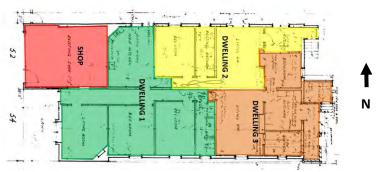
BR-133A/1968 plans, showing three dwellings and one commercial space.
